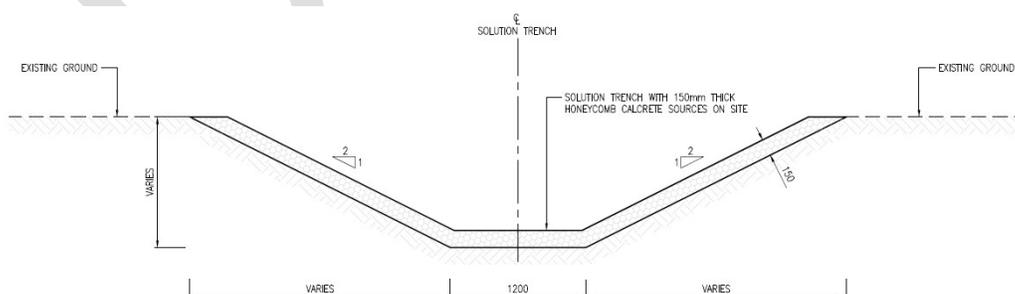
Typical cross-section of stormwater drains around TSF 2
